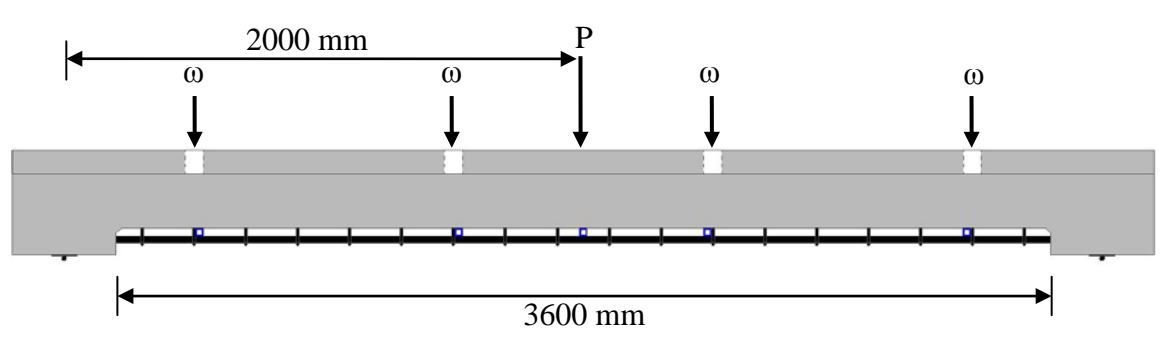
Elevations of Test Specimens with Loading Configuration, Void Location and Steel Spacer Locations.
